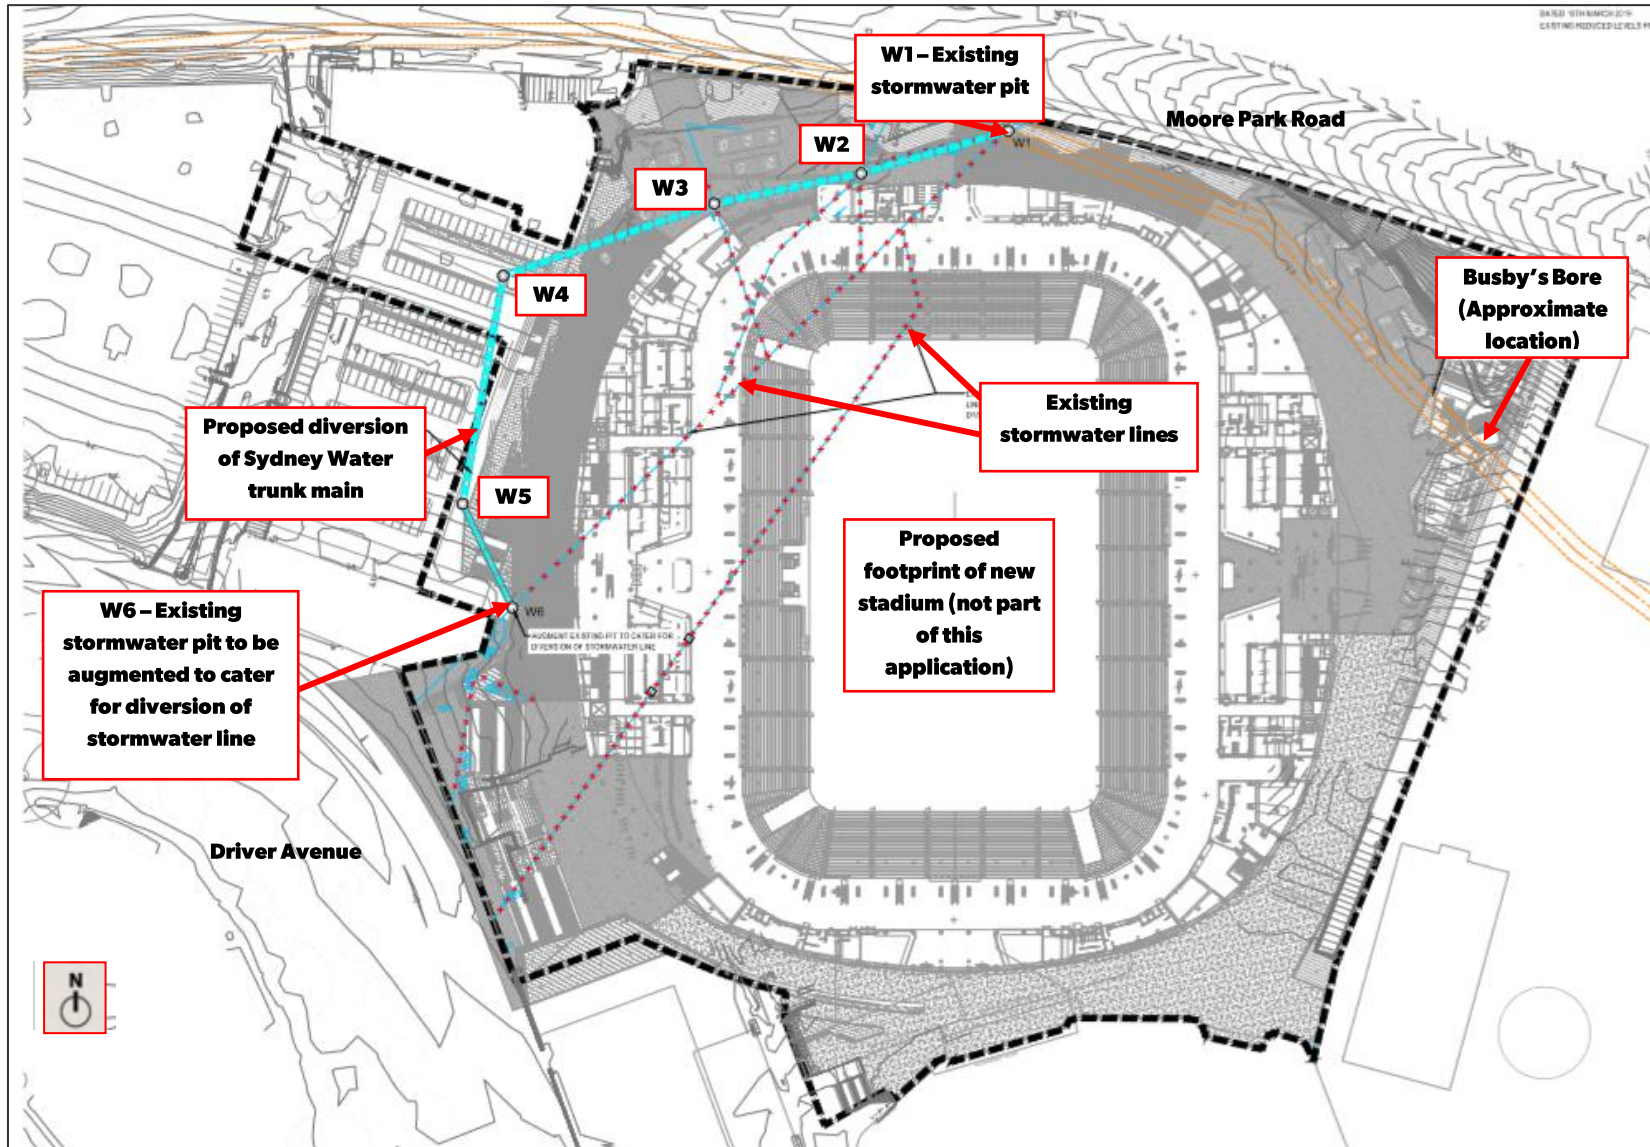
| Stormwater infrastructure diversion plan (Source: Applicant's Modification Report)
